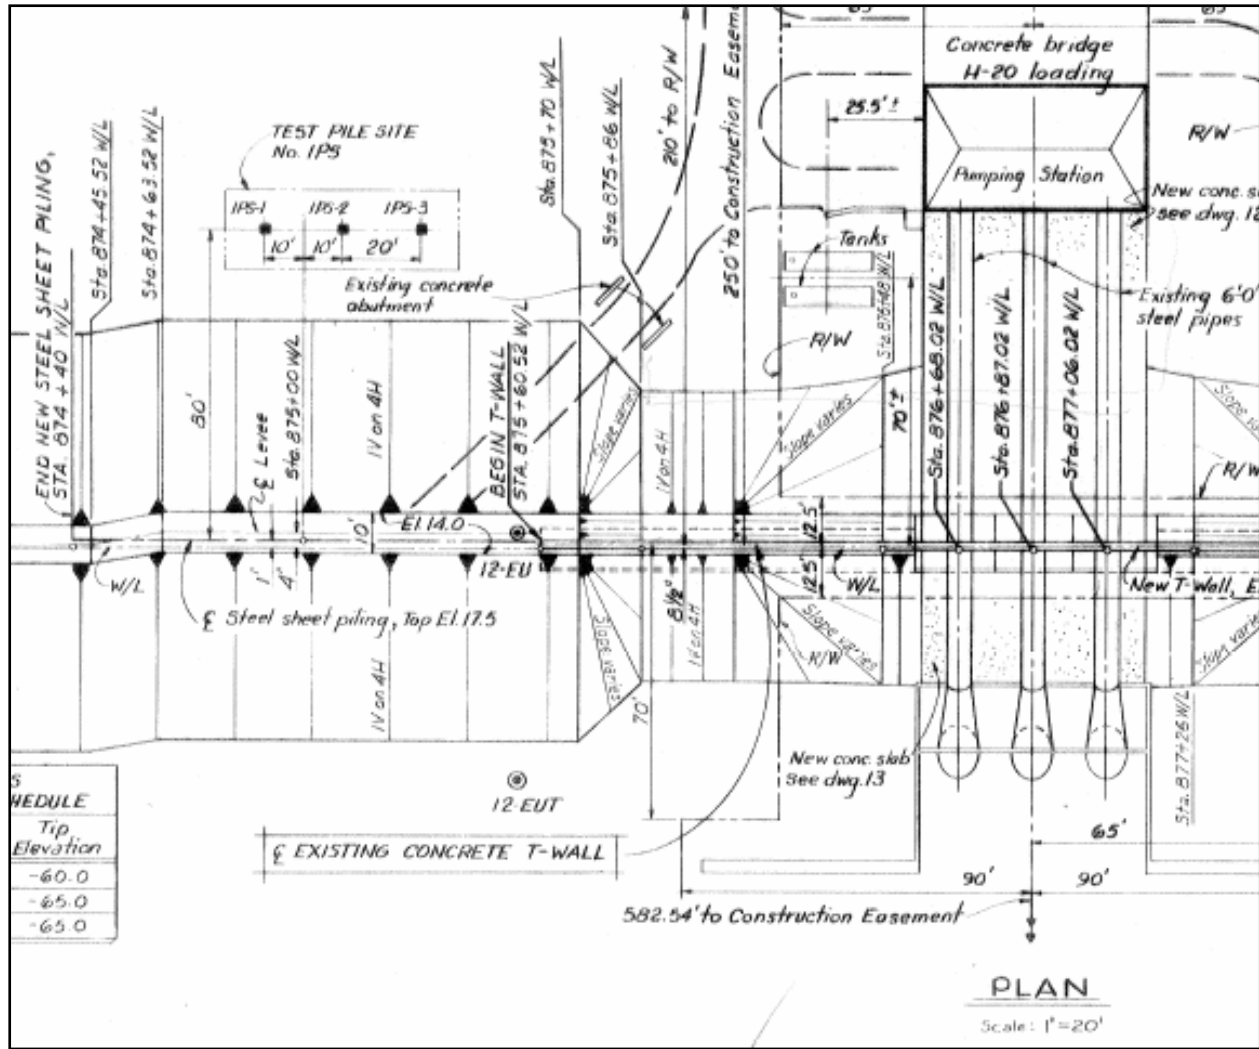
NOE2_F Failed Sheet Pile Section Between Sta 874+40 and T-Wall at Sta 875+60 (Plan view)
